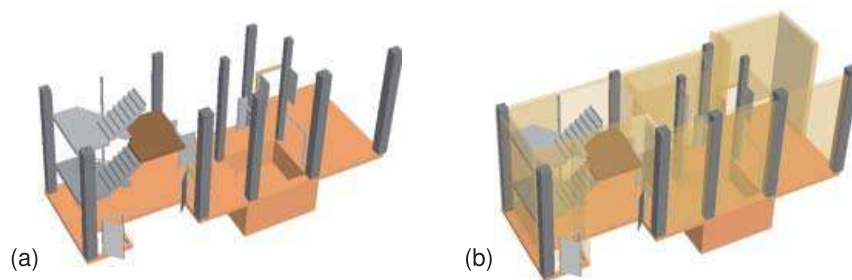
(a) Ground floor slabs, columns, stairs – (b) walls
